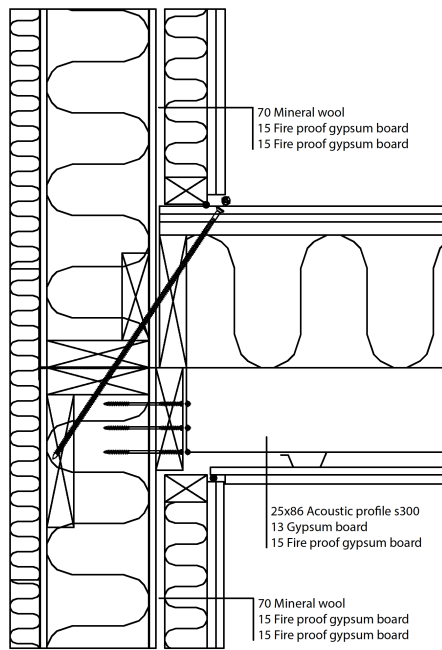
Assembly order for an exterior wall in a multi-story residential building from A-hus. With all material specifications and dimensions. Notice that there is a small gap between the wall and the floor in the figures and that gap is 8 ± 4 mm due to the need of adjustment on the working site.
